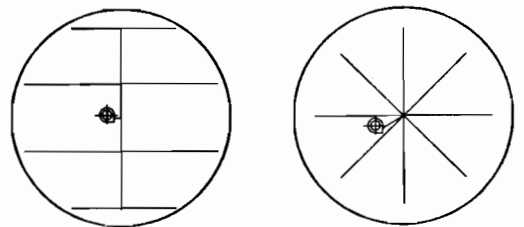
Plan view of ventilation ducting for cylindrical grain stores.
